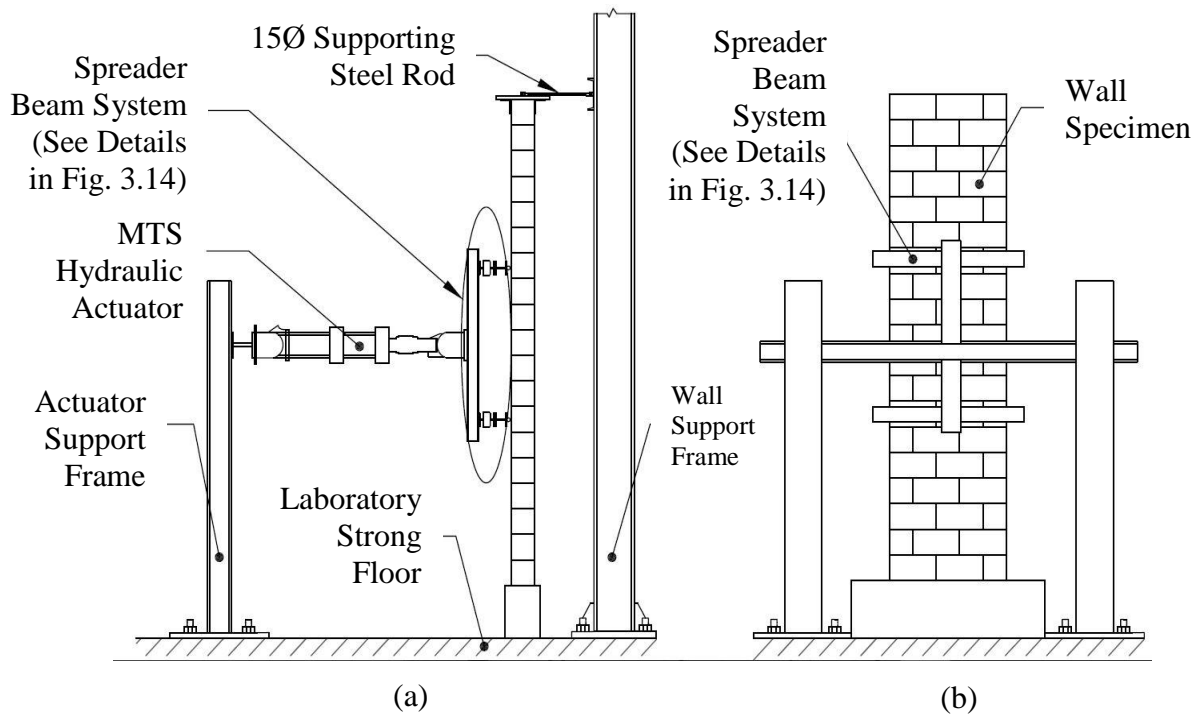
Design of Test Frame Setup for Wall Specimens: (a) Side View, and (b) Front View
